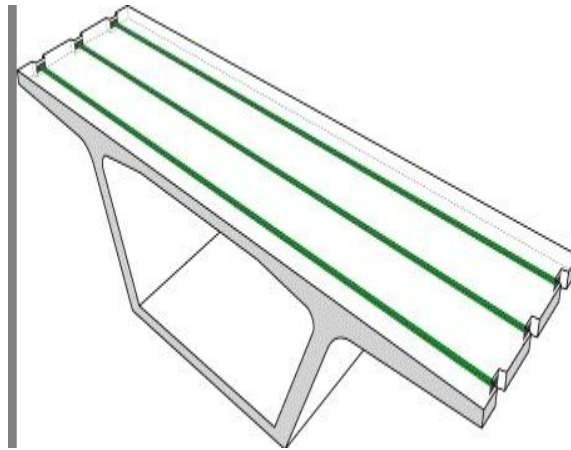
Transverse Post-Tensioning in the Top Slab of Box Girder
